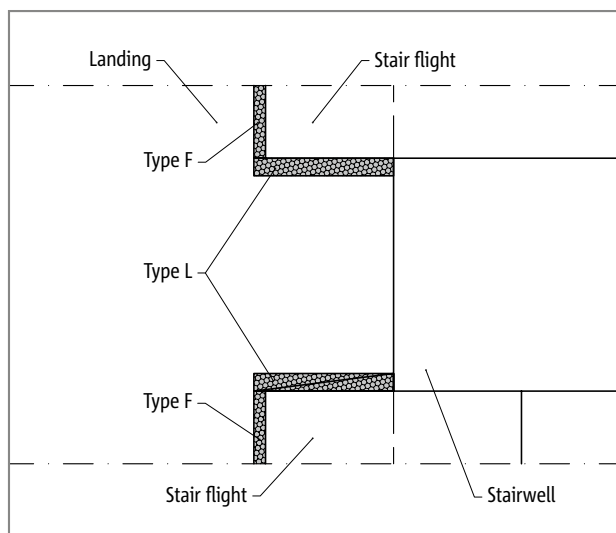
Schöck Tronsole® type F: Element configuration, Detail A
